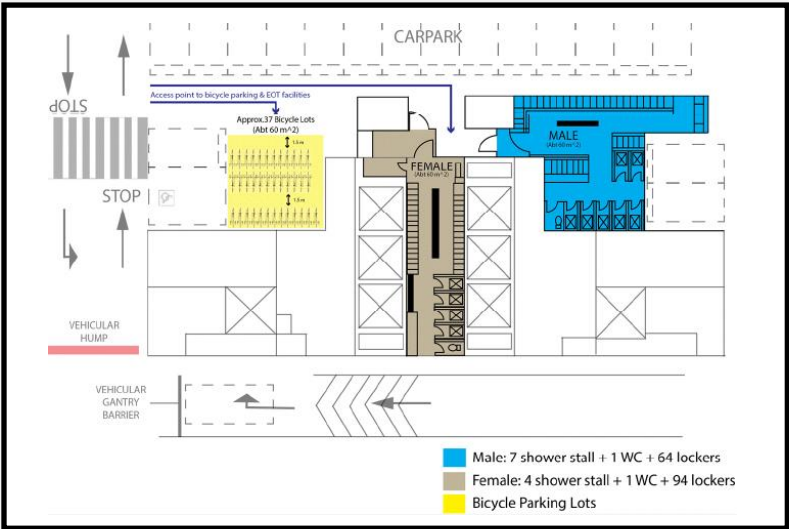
Example of a Bicycle Parking and End-of-Trip Facilities Plan
